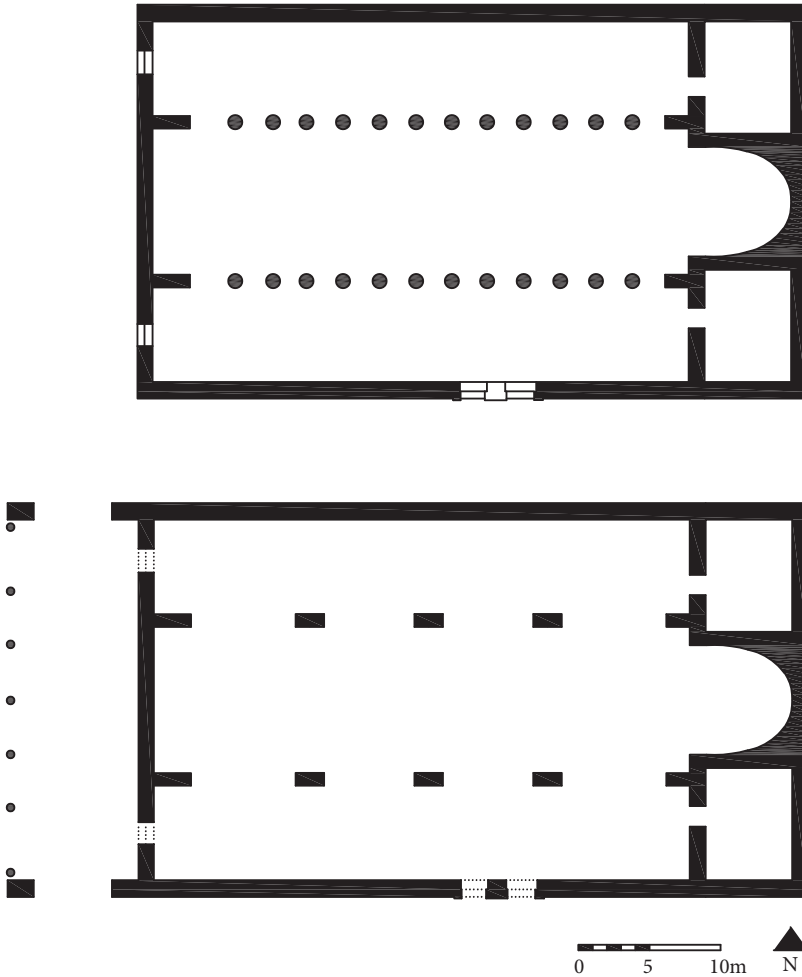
Reconstructions of the basilica as a column and a pier basilica
